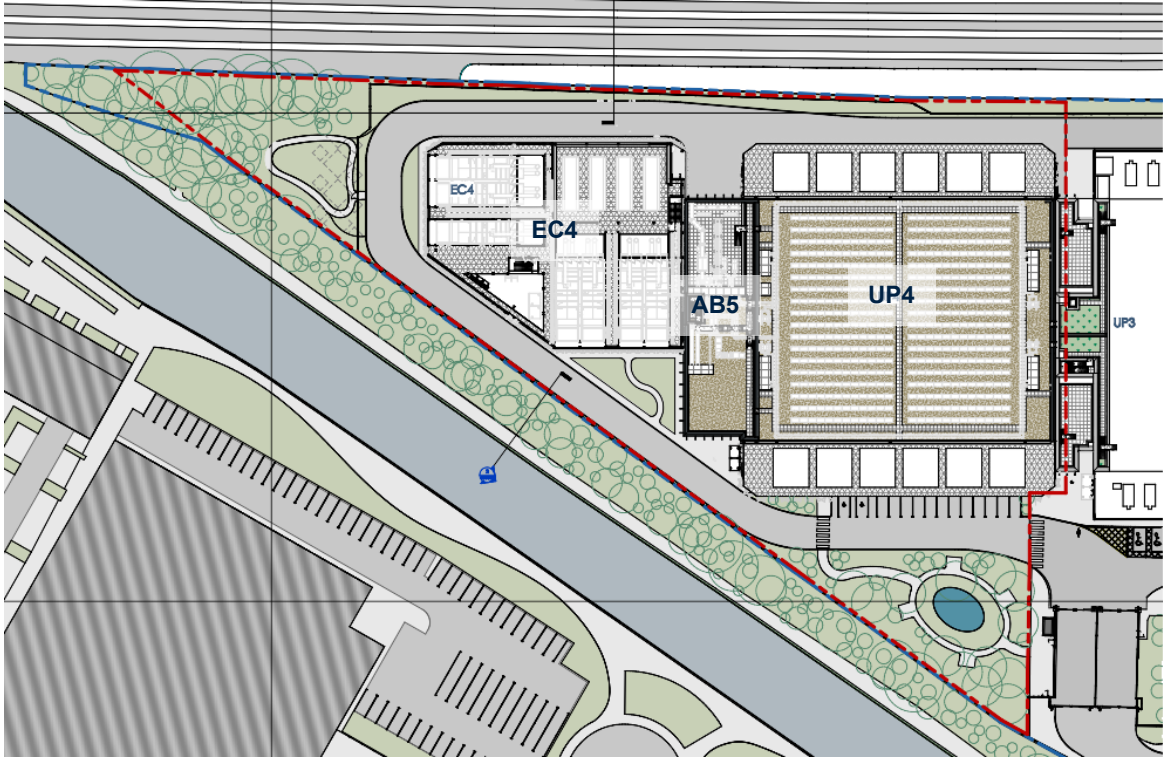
Enlarged Site Plan (ref.NWA-0474-SW-ZZ-DR-A-900001-B4)
